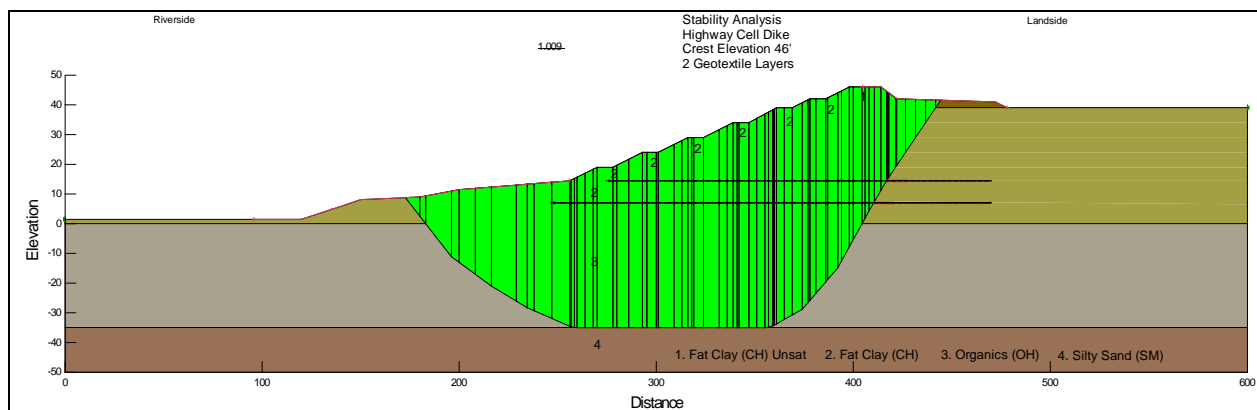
Highway Cell. Elevation 50'. 2 Geotextile layers. FS = 1.009
